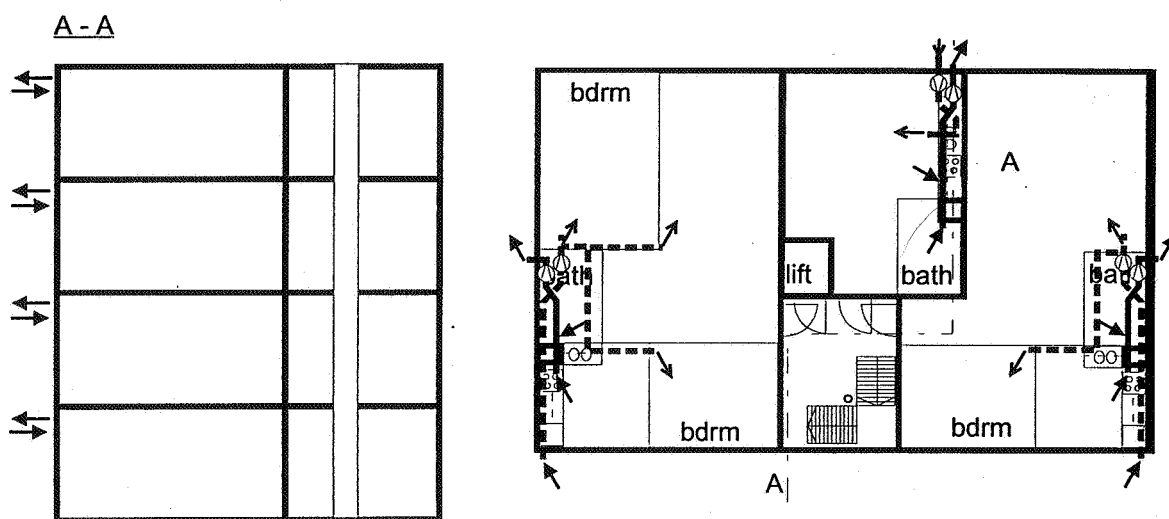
Plan and section of a typical Finnish apartment block with apartment based ventilation units.
